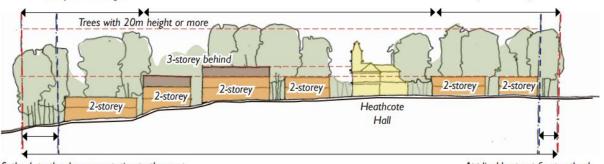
Proposed and amended residential development, S-E & N-E elevations. Drawing by the Architects.
